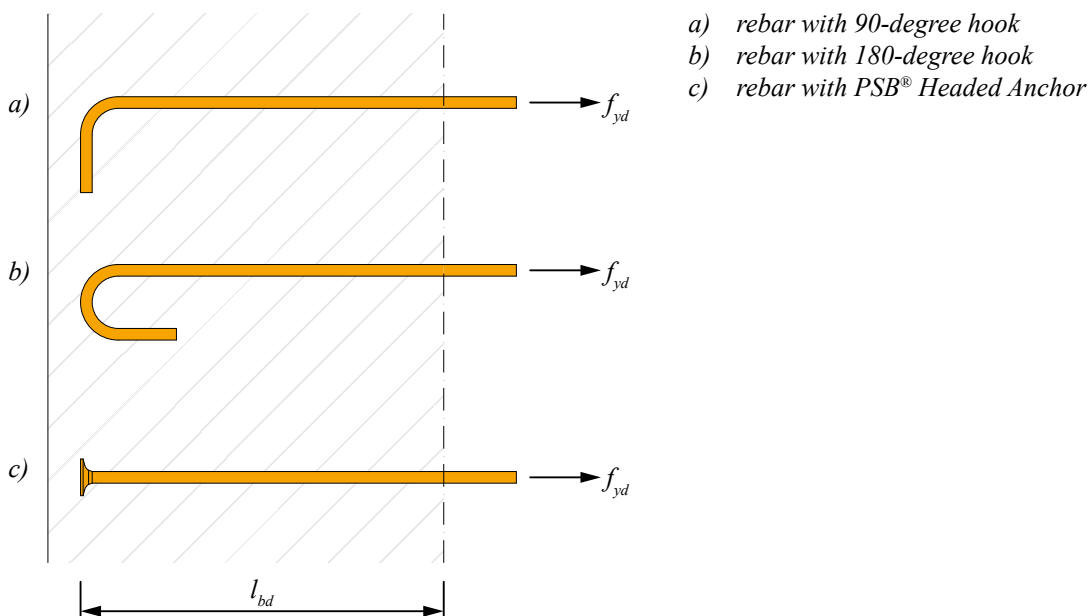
Anchorage length of the hook and PSB® Headed Anchor.
